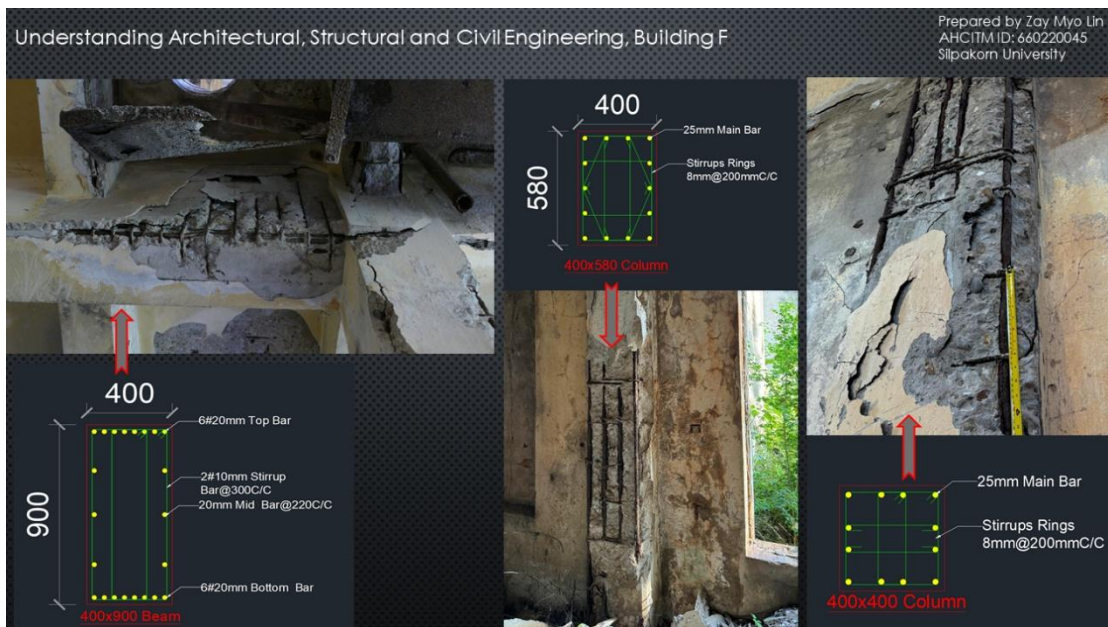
Column, Beam sizes and rebar design most founded at Building F
